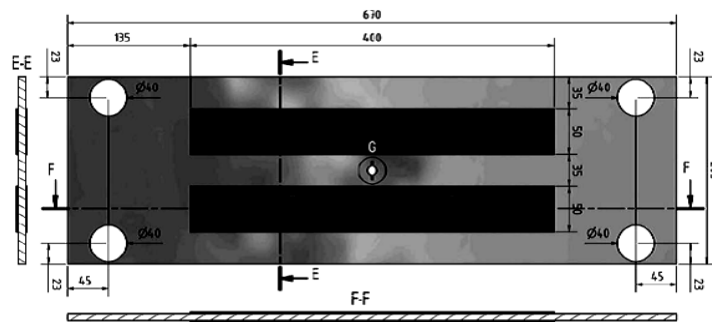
Reinforced steel plate specimens configuration, Täljsten et al. (2008)
